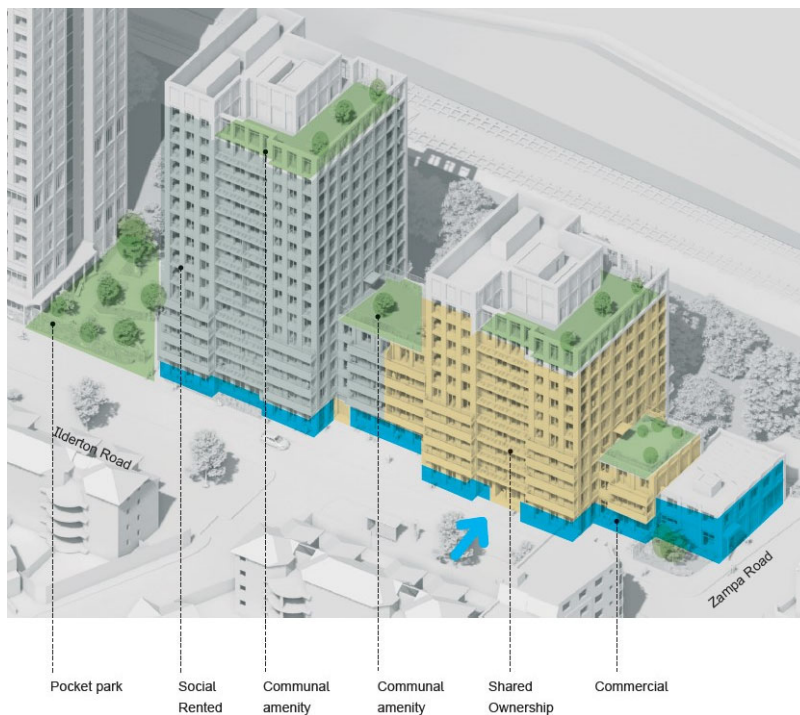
(above right): Isometric of the South Building showing the distribution of the proposed uses and location of green spaces.
